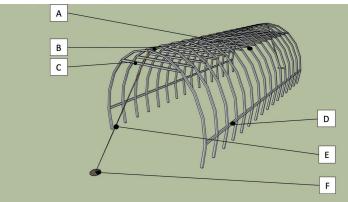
An example of a caterpillar tunnel structure. A. Rib, hoop, arch, bow; B. Purlin, ridgepole; C. Cross bracing (optional); D. Wind bracing; E. Rope; F. Ground anchor. Credits: UF/IFAS
